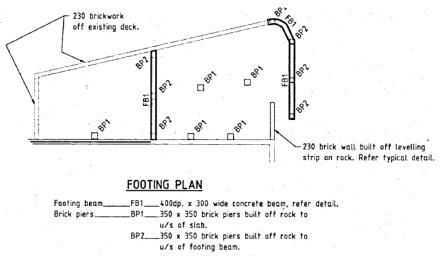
Approved footing plans (reference H1246-S1) for Building Approval 808/94 (source: GIPA request from NBC)
